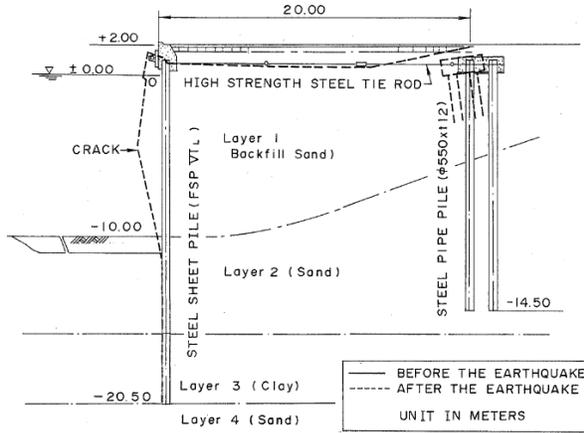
A cross section at Ohama No. 2 Wharf - Akita Port, Japan (Iai and Kameoka, 1993)
